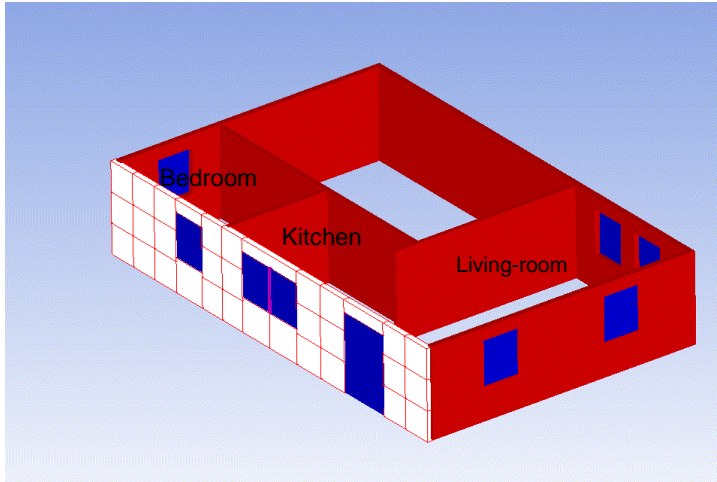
Drawing of ground floor of the Lykkebo model with front wall elements
